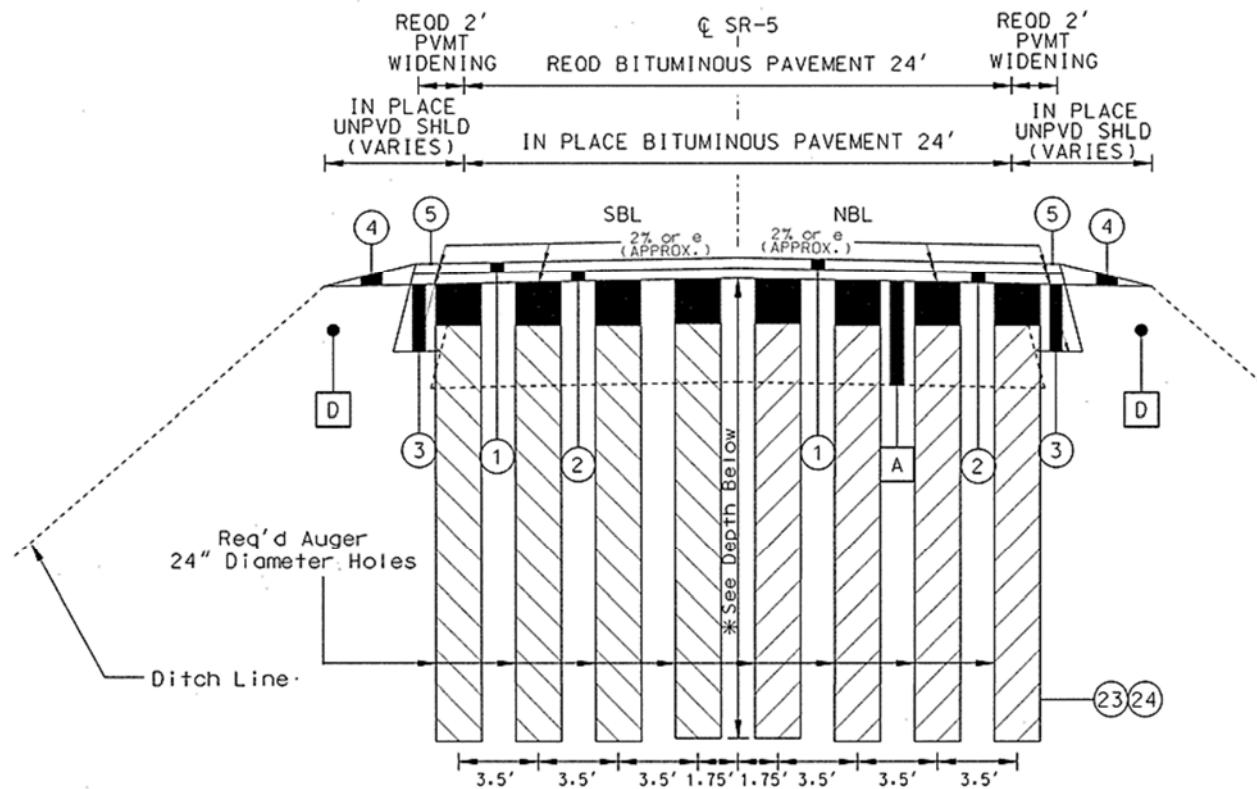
Deep Mixed Columns Cross Section (ALDOT 2015)
